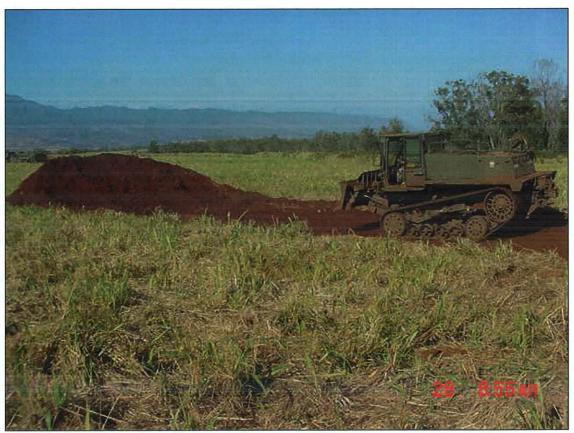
A 'Deuce' Beginning Excavation of TOC Surrounding Berm. Viewed to West.
